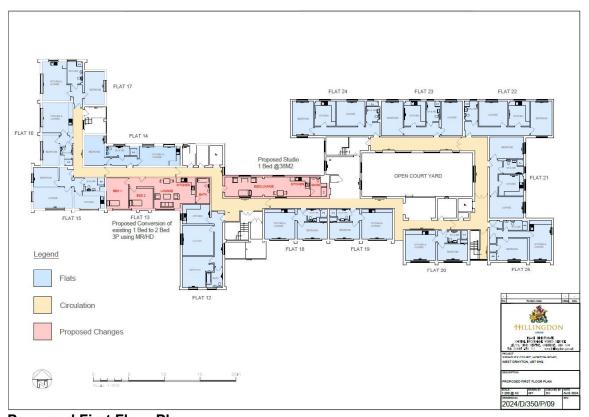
Proposed Plans (please note – larger version of plans can be found in the Committee Plan Pack)
